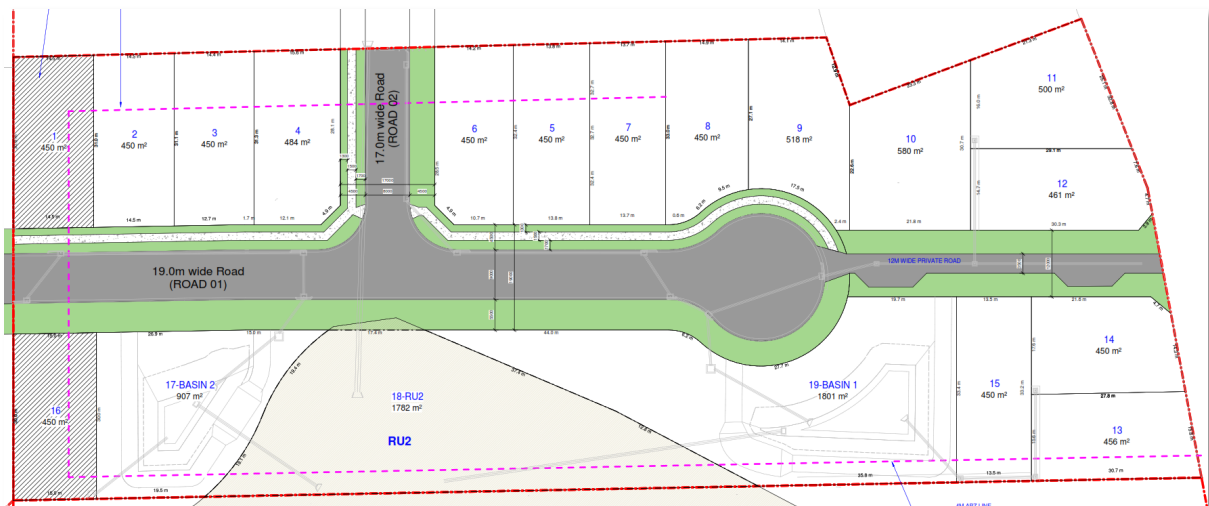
proposed Subdivision Plan (Prepared by the Bathla Group)
